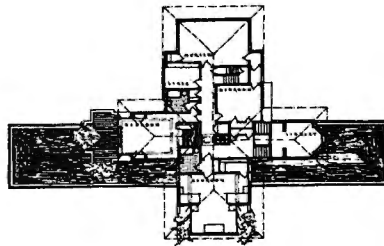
F.L.L. Wright, Willitts house, 1902. Upper floor plan.
